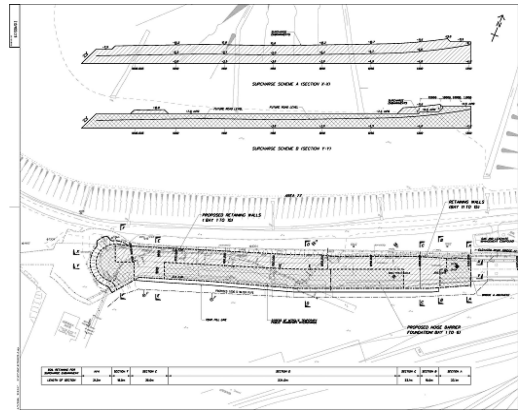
Layout of reinforced surcharge block (Tseung Kwan O).
